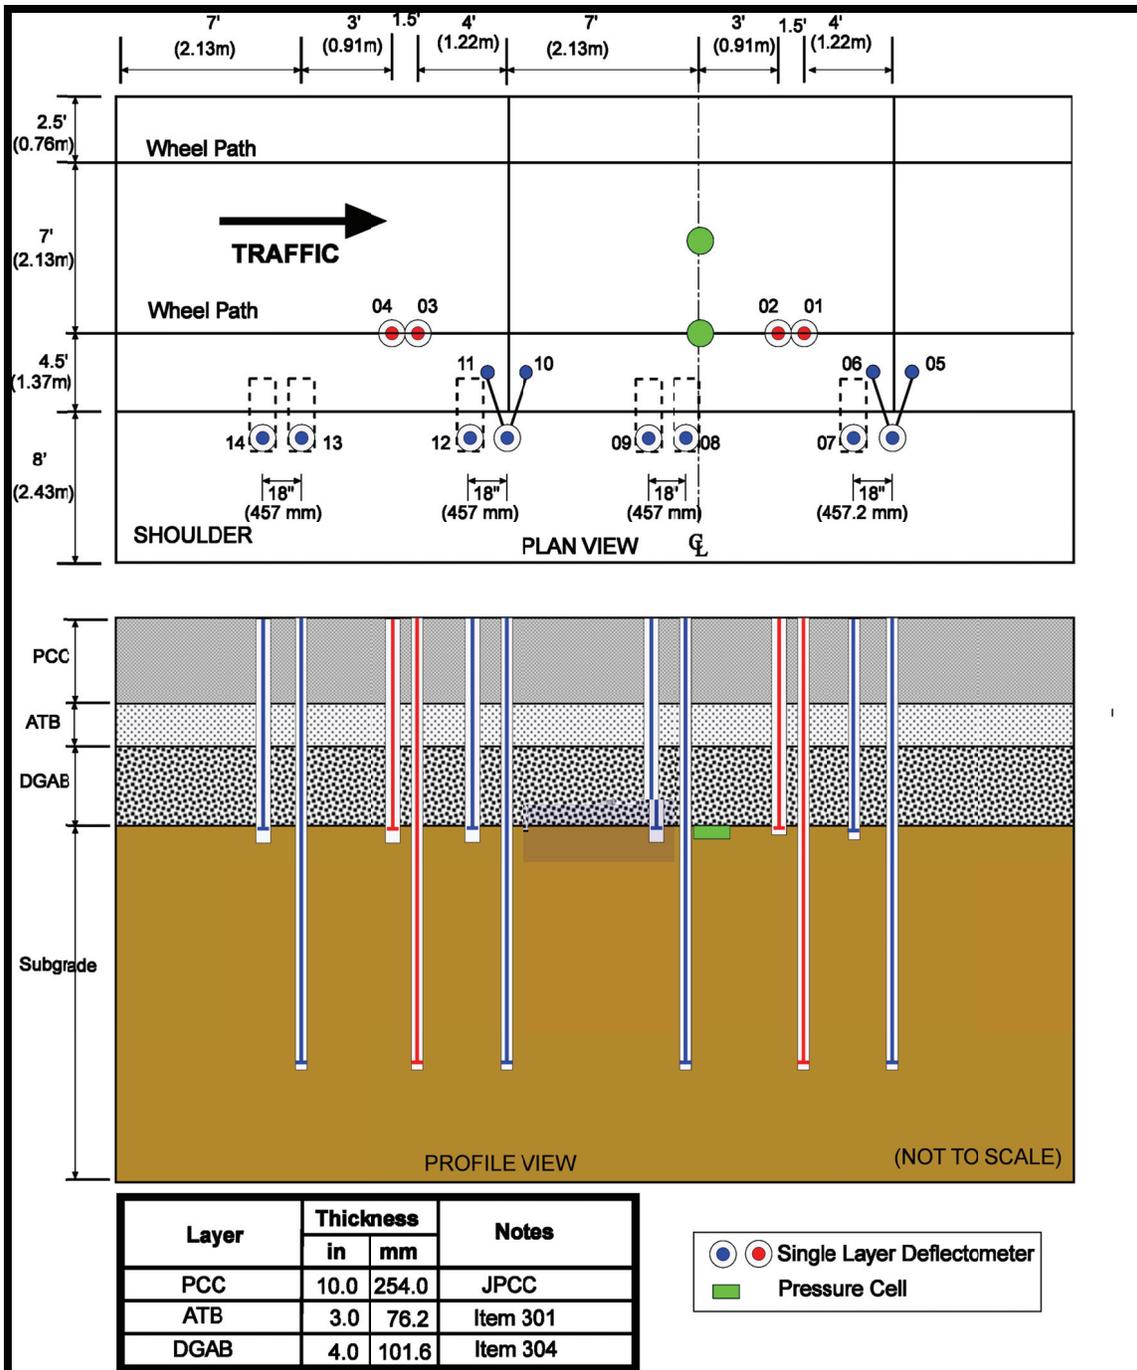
Instrumentation Plan and Profile Views for PCC Sections 664 and 876
